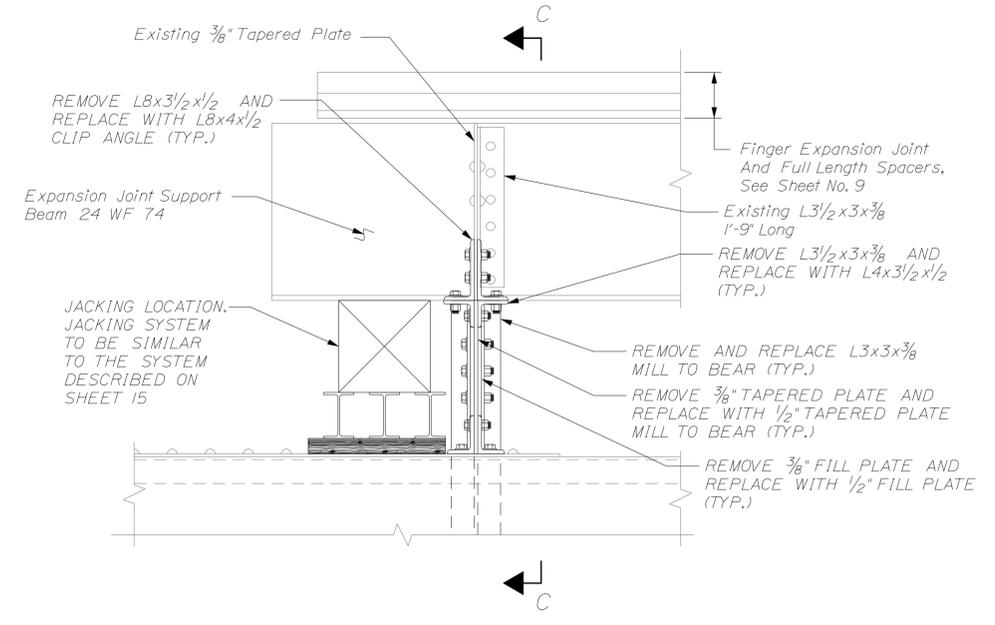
DETAIL I - PROPOSED PIER 5 EXPANSION JOINT SUPPORT BEAM STIFFENER AND PEDESTAL REPLACEMENT
